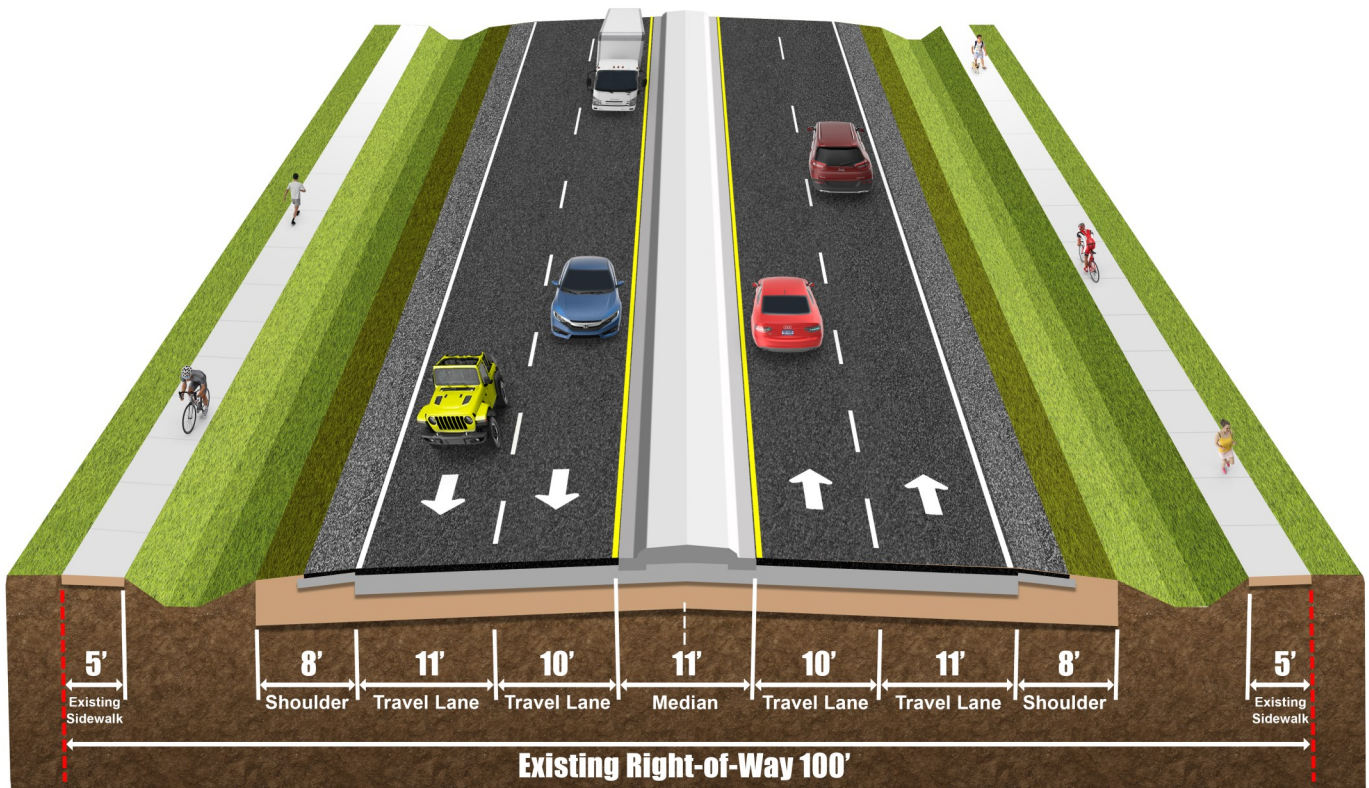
Proposed Typical Section of North Courtenay Parkway with Raised Concrete Median
